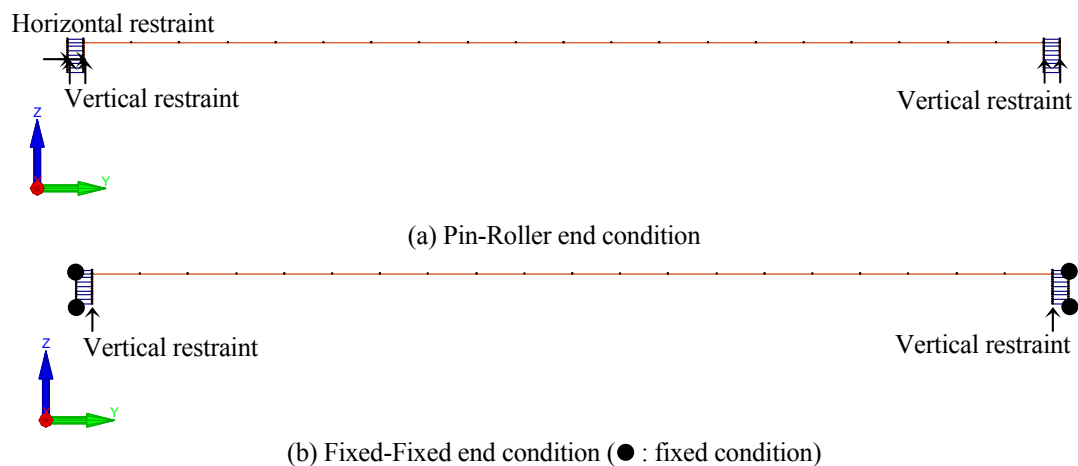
End conditions of prestressed concrete slabs using multi-spring connection elements
